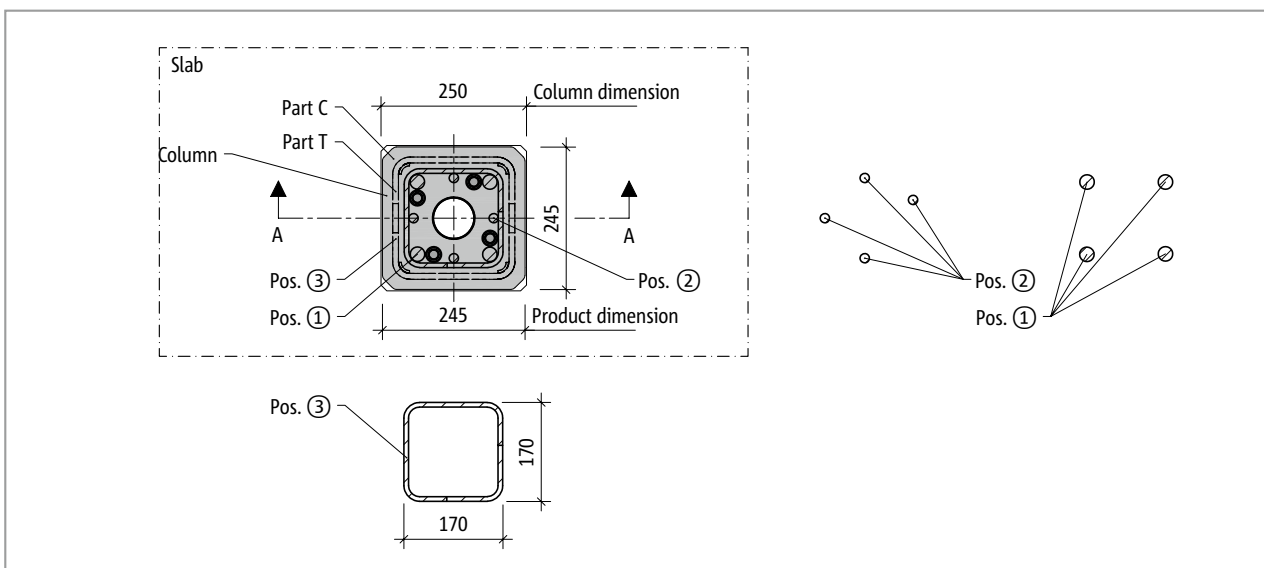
Schöck Sconnex® type P: On-site reinforcement in column cross-section
